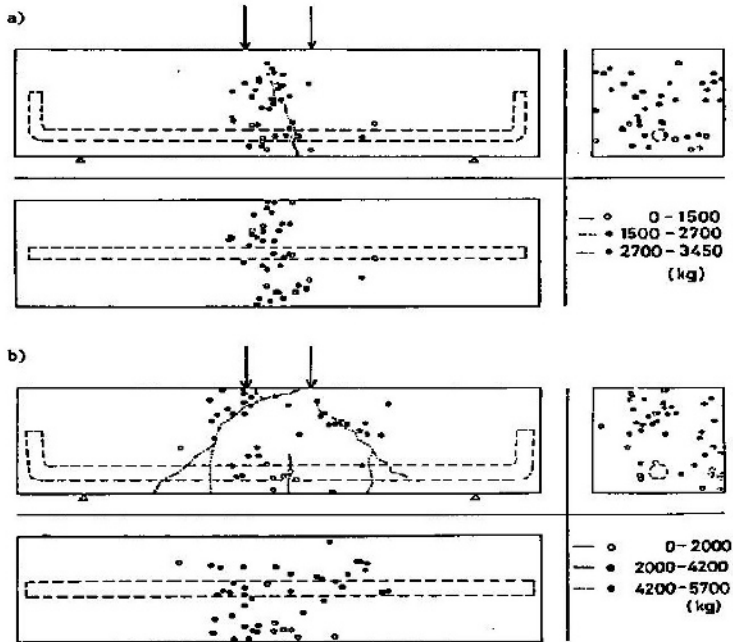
Located AE sources in reinforced concrete beams of (a) bending-mode failure and (b) shear-mode failure.
